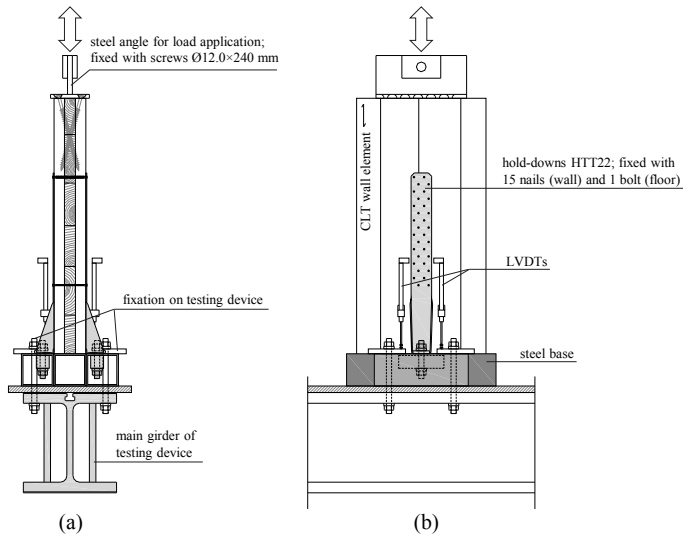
test set-up for monotonic and cyclic experiments on configuration Z_V2_T21 – (a) sheer plan; (b) front view
